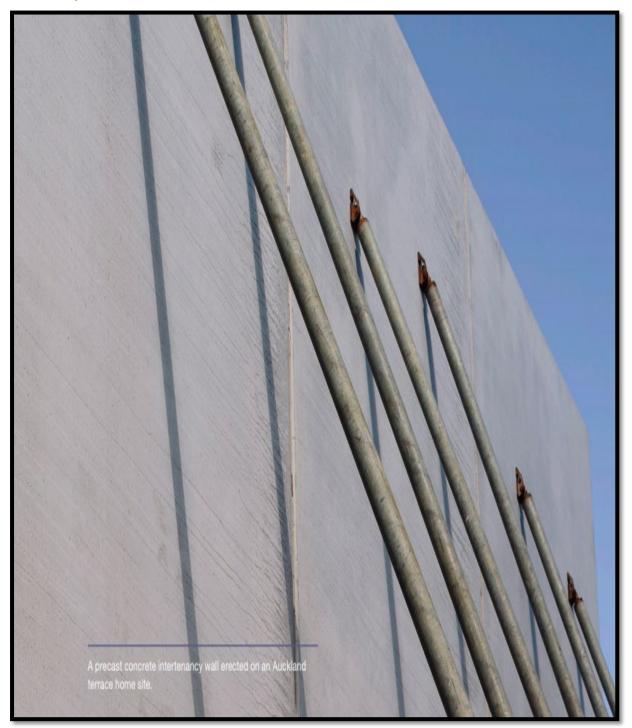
Sample of precast concrete intertenancy fire rated wall, sourced from 'Gib Terrace home guide'
